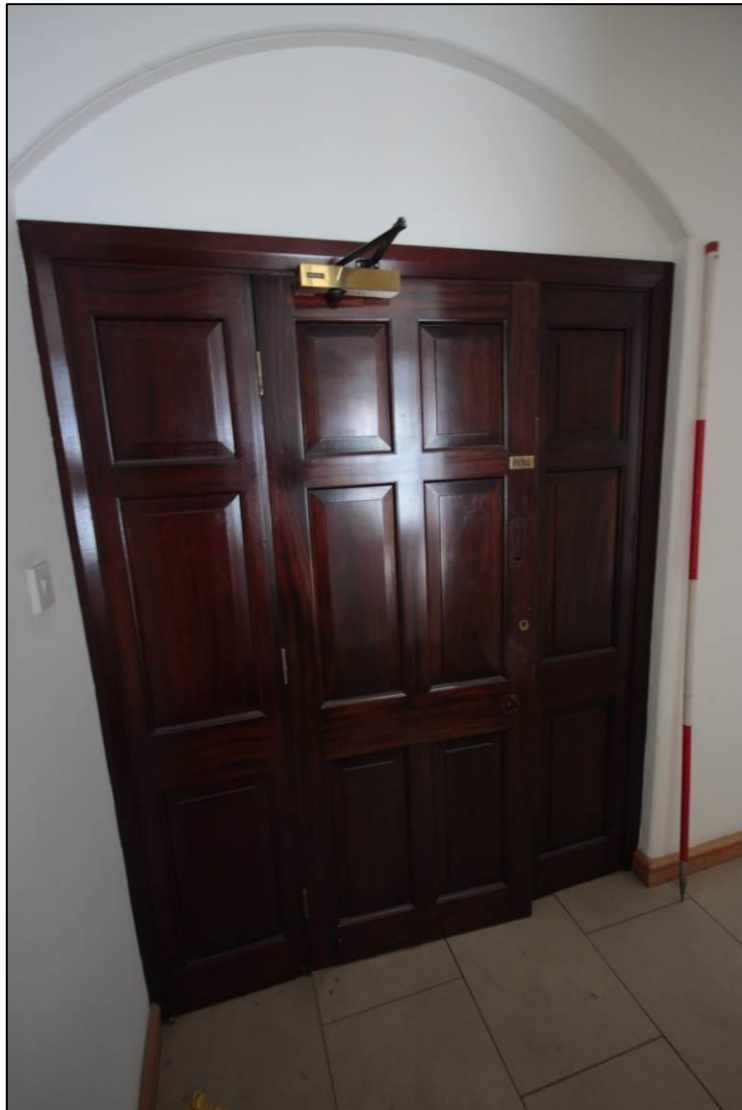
The timber-panelled door providing access to GF5, taken with 2m scale facing north
